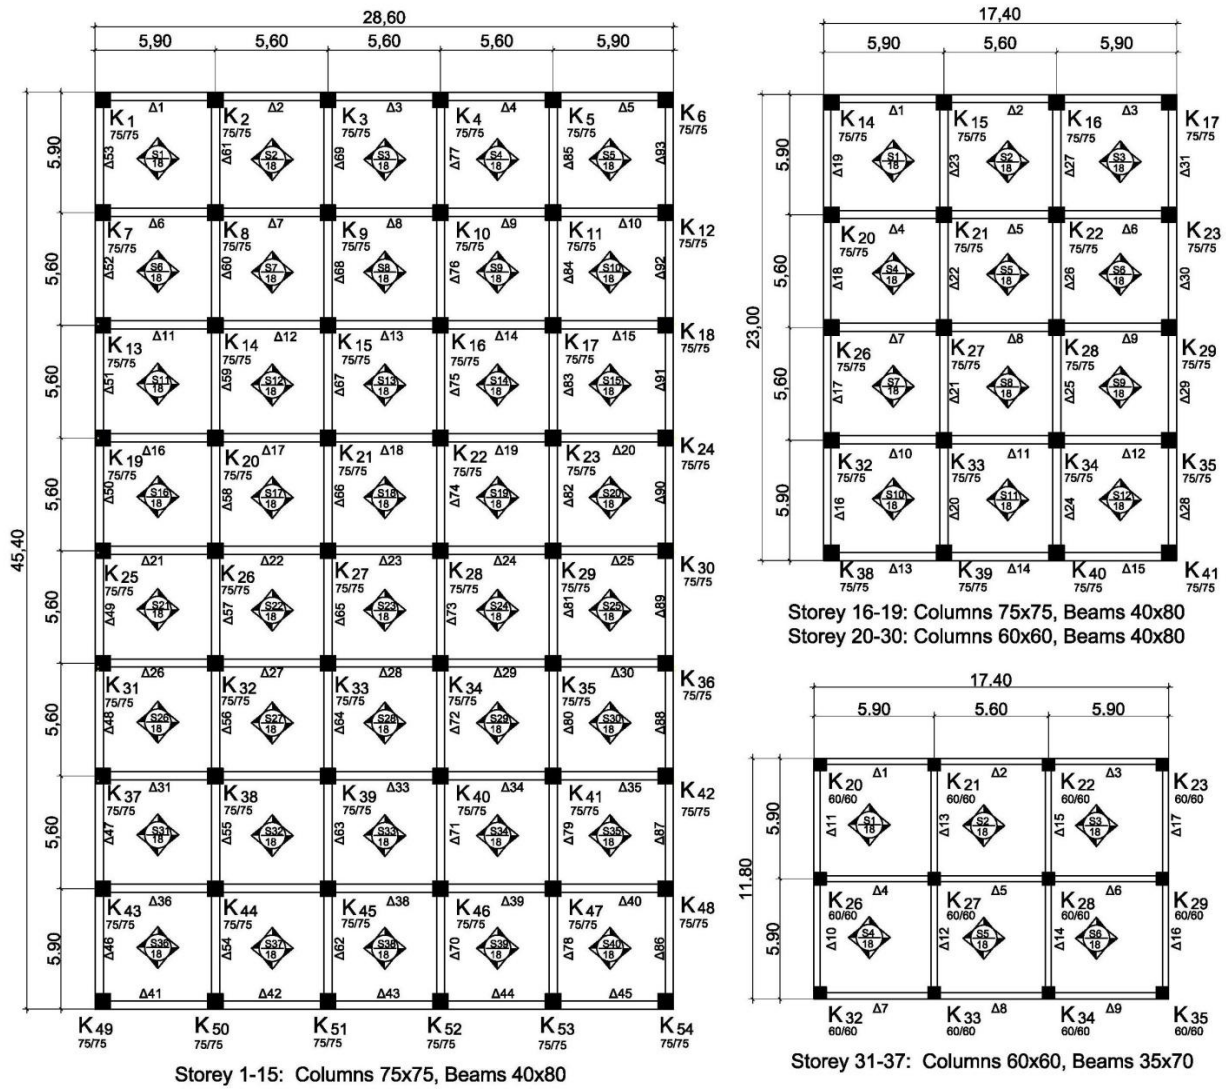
RC HIGH RISE BUILDING. PLAN VIEWS AT DIFFERENT LEVELS.
